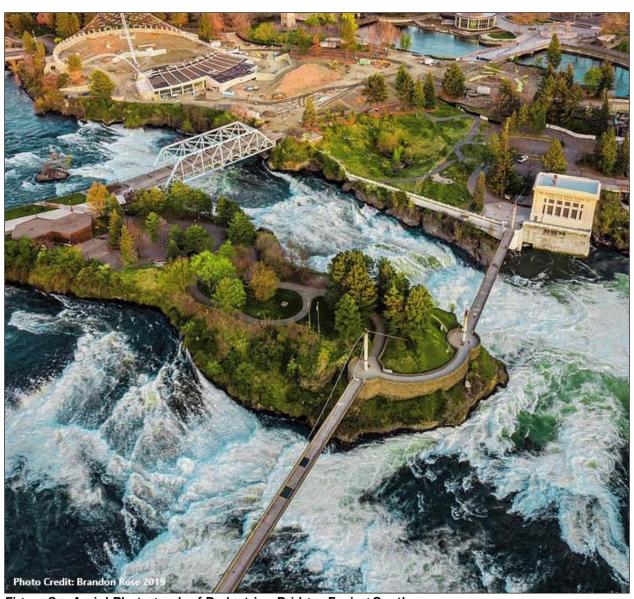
Aerial Photograph of Pedestrian Bridges Facing South
